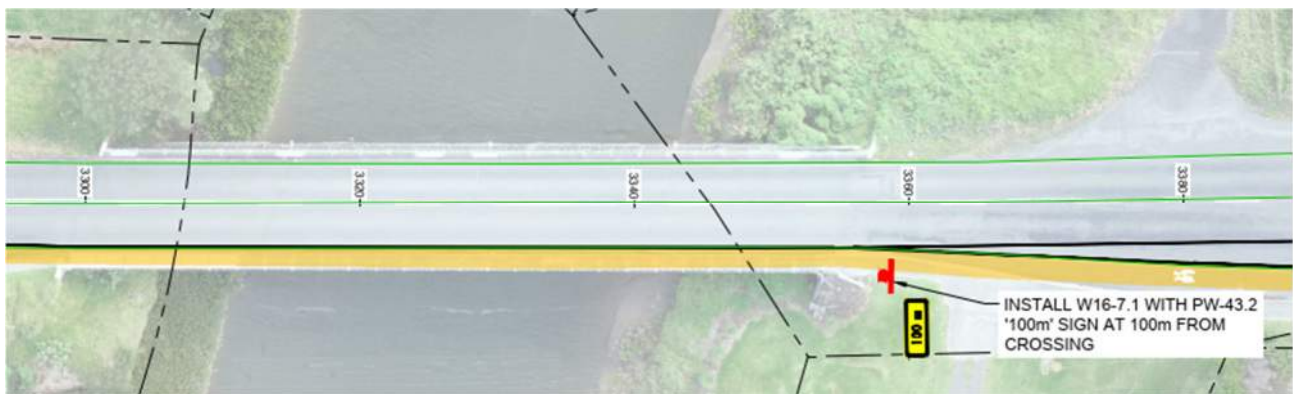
Bridge along Marsden Point Road (RP 3300 - 3340m)
